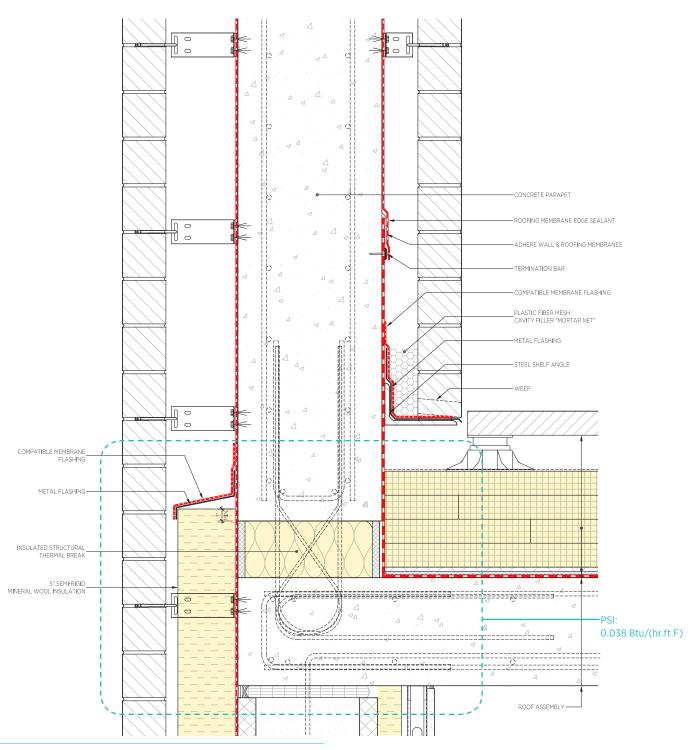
Passivhaus Proposal -Brick cavity at roof parapet
